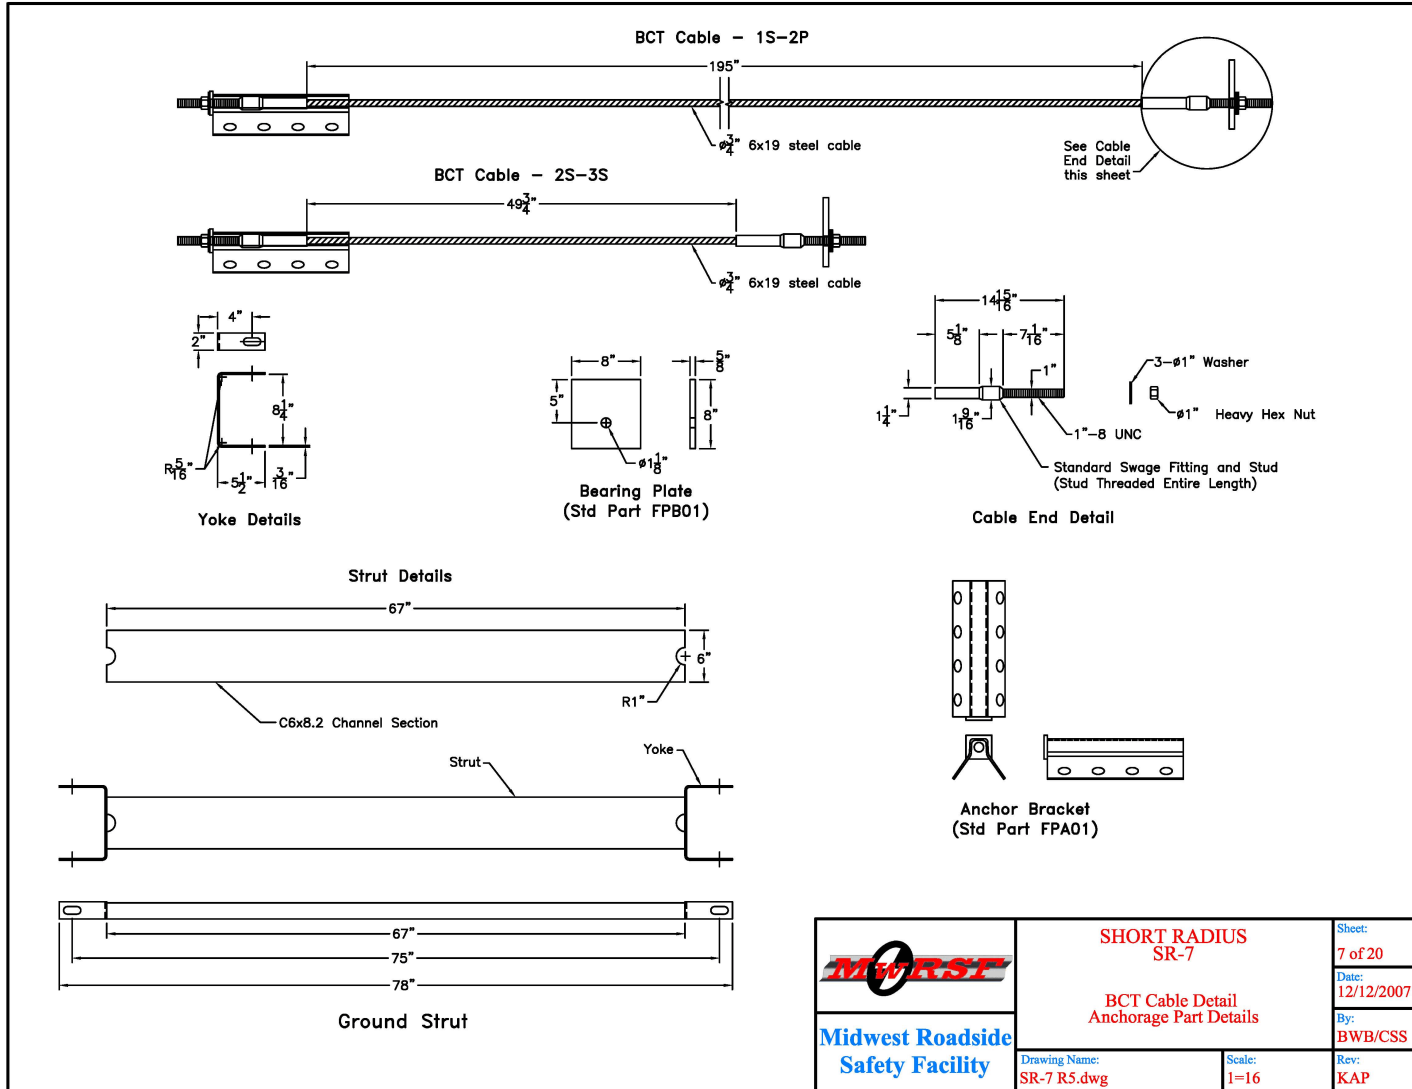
BCT Cable Detail and Anchorage Part Details (English)
